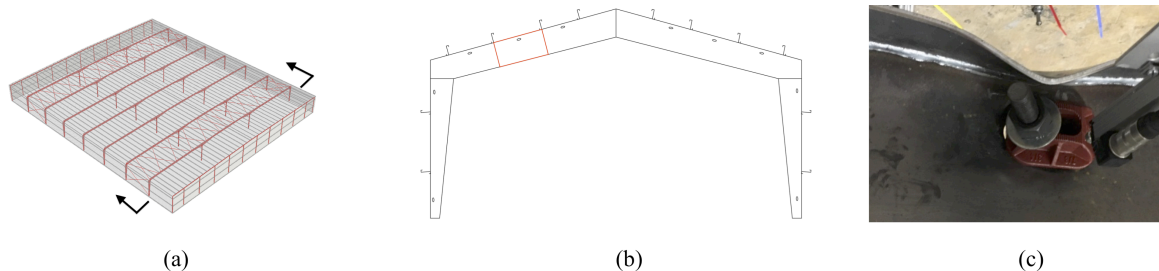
Rod bracing as a lateral system in a metal building: (a) bracing ties primary steel frames together in roof and walls (MBMA 2016); (b) rods are typically anchored near the top of a primary frame; (c) view from back of rod bracing anchorage location - local buckling deformation can develop if the primary frame flange is used to carry the rod brace force before it is taken out by flange bracing or girts or purlins
